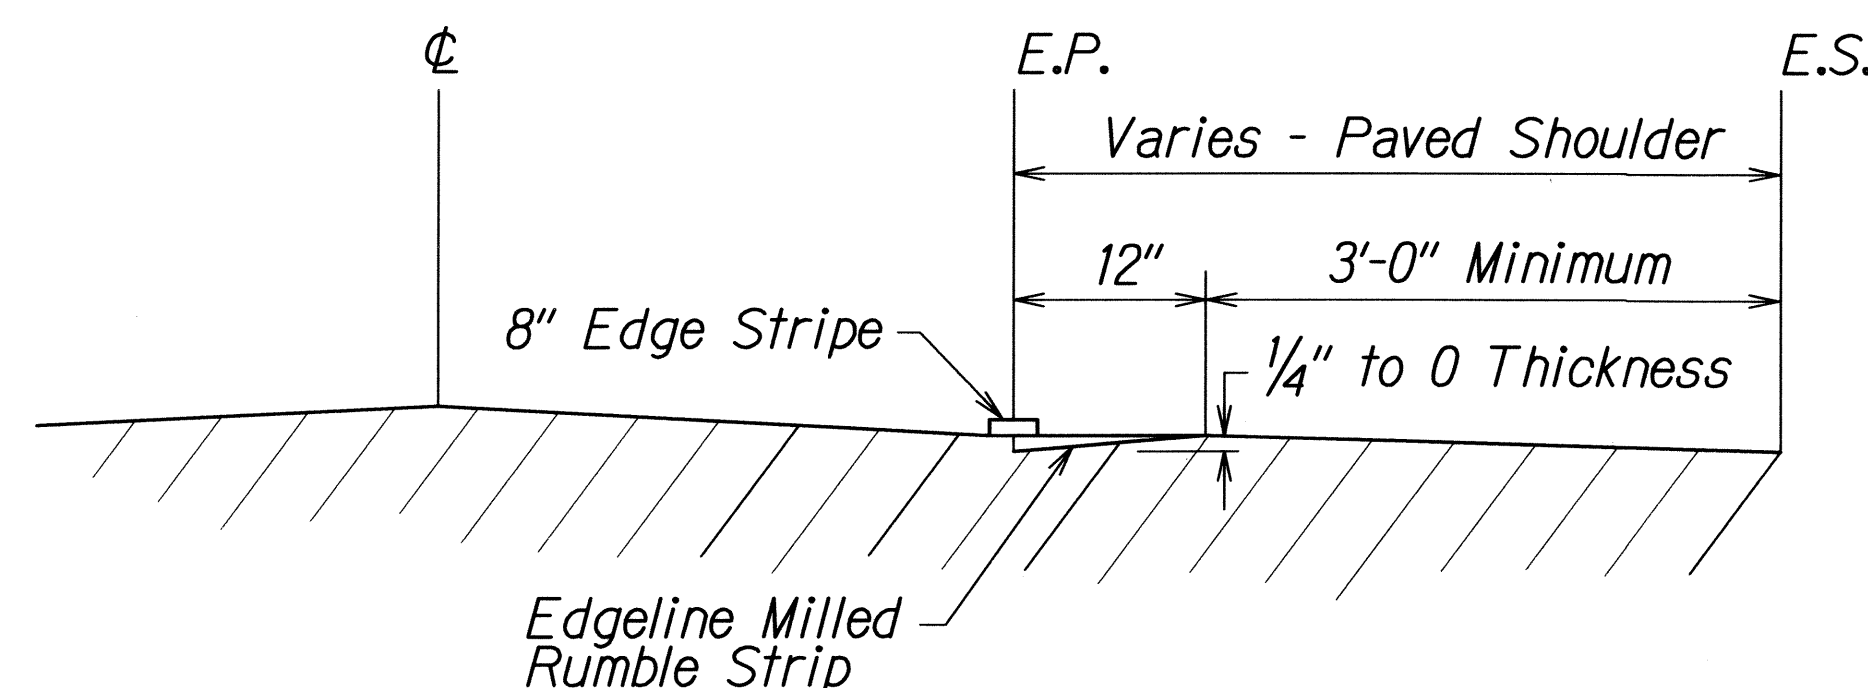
DETAIL - EDGELINE MILLED RUMBLE STRIP
